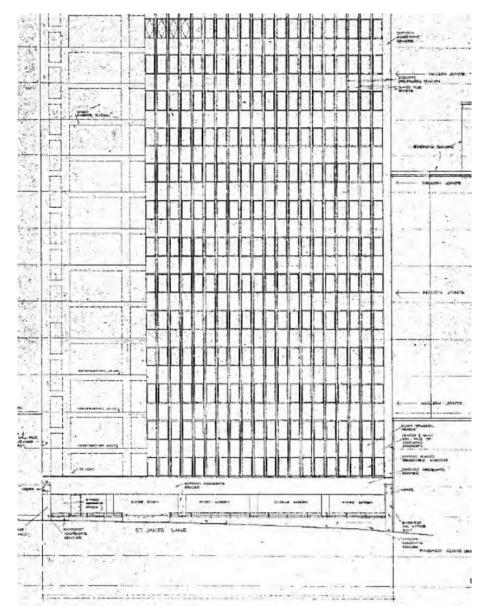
The north elevation; with a higher ground level at St James Lane (BAP).
